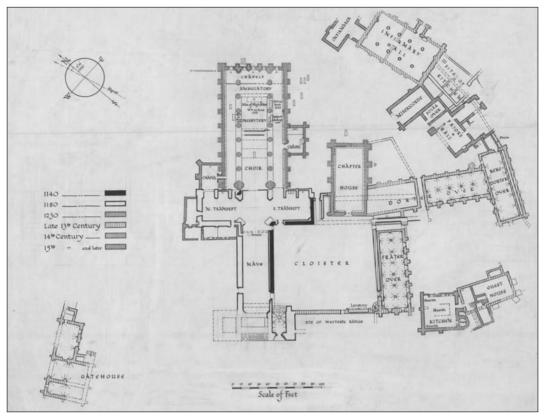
Site plan of Kirkham Priory. ©Historic England Archive
